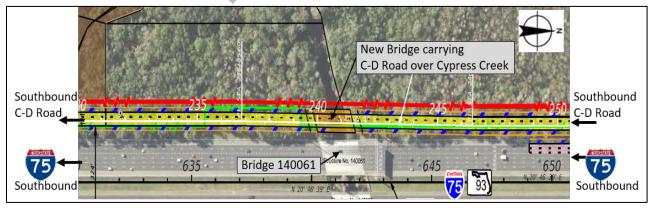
Preferred Alternative—New C-D Road Bridge over Cypress Creek (Figure 1-5 is not to scale and compressed to fit on page)
